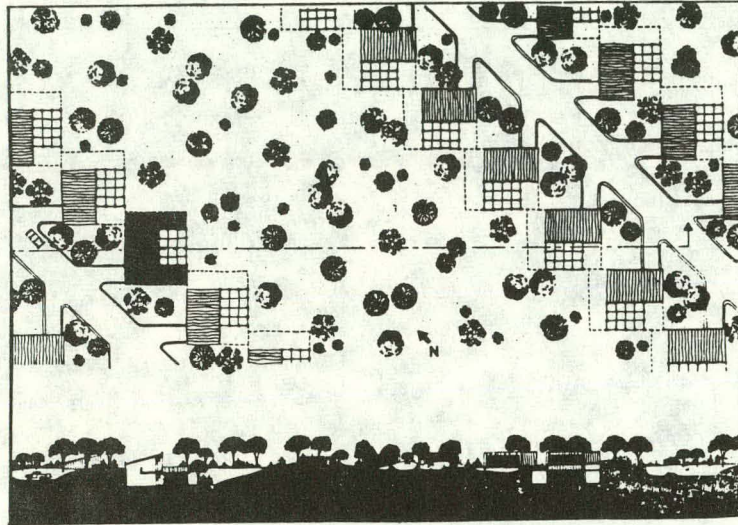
Plan and section of a high density earth protected housing development plan (drawn by John Carmody).
